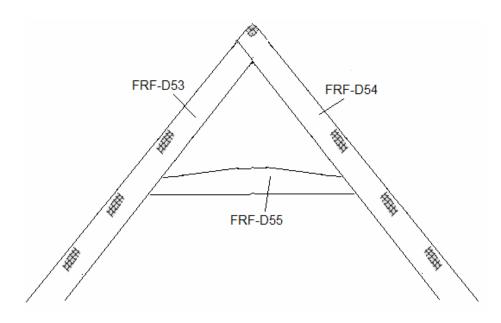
Connecting range; sketch of truss 9, showing the location of samples FRF-D53-5
